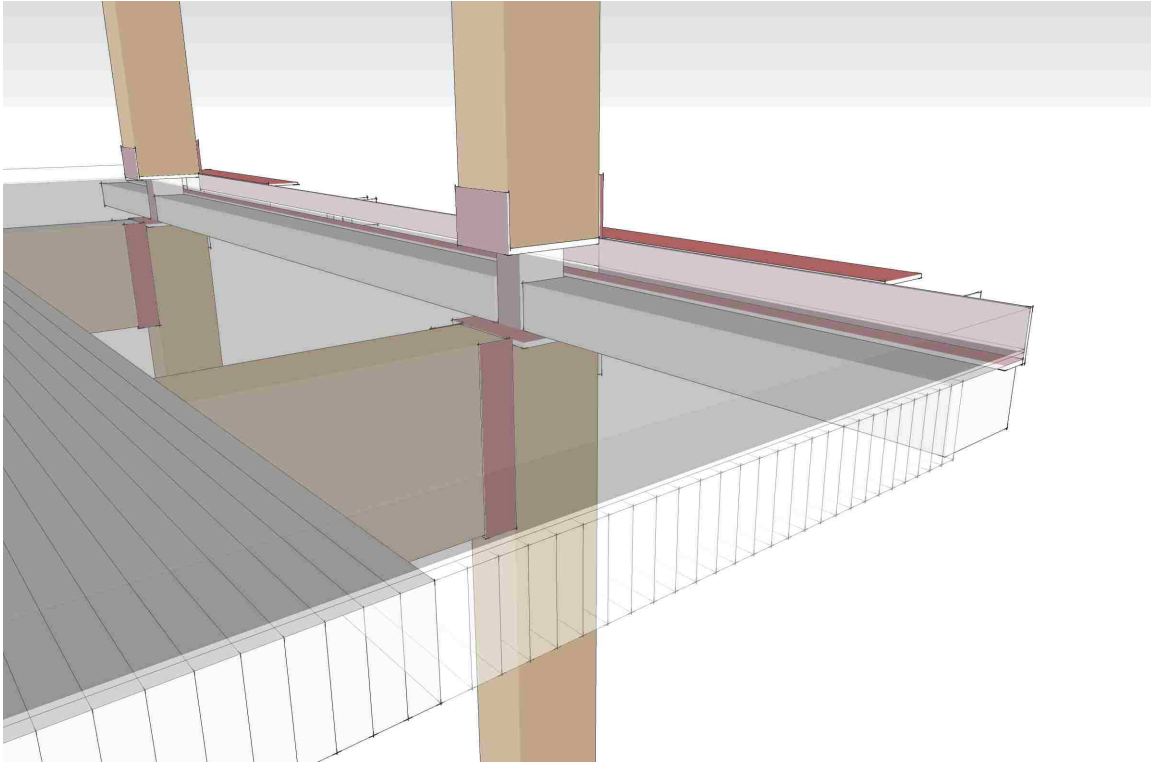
Cutaway detail of Floor assembly. Steel angle in distance carries exterior wall panels.
